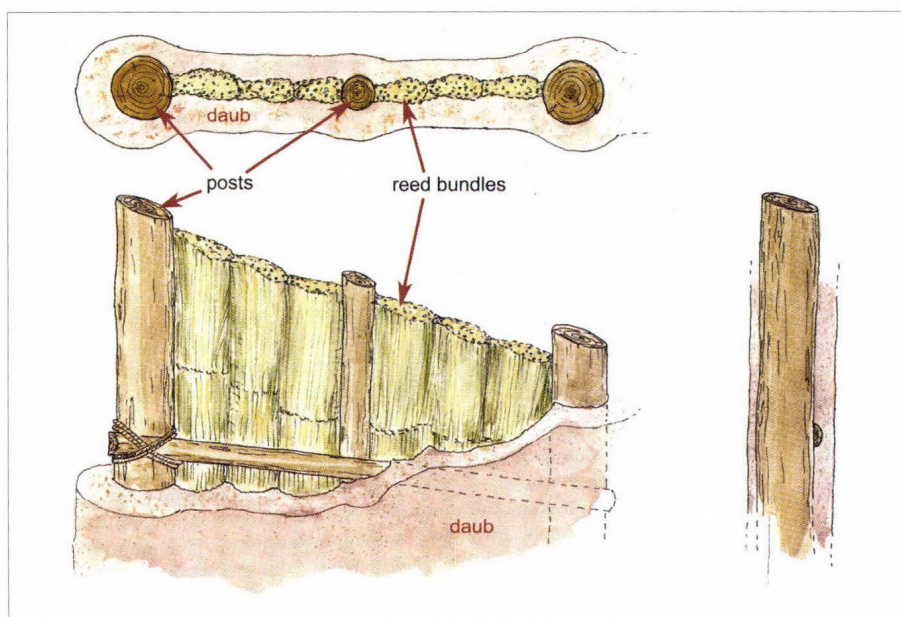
The wall detail in the ideal reconstruction of the structure from Ecsegfalva 23
